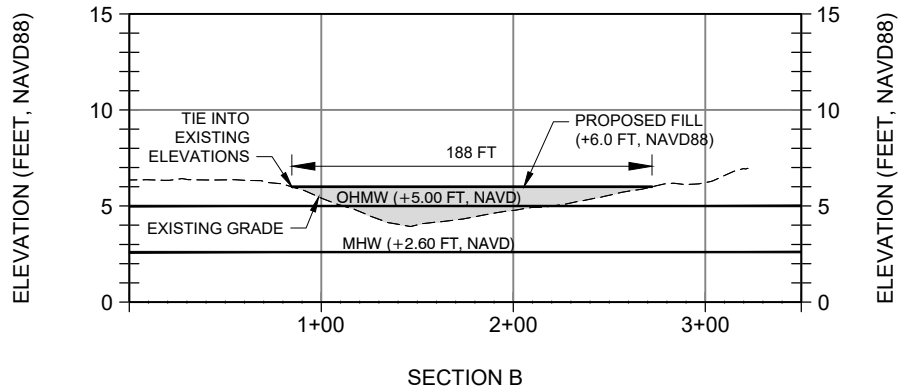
ALTERNATIVE 2 CROSS SECTIONS & DETAILS
